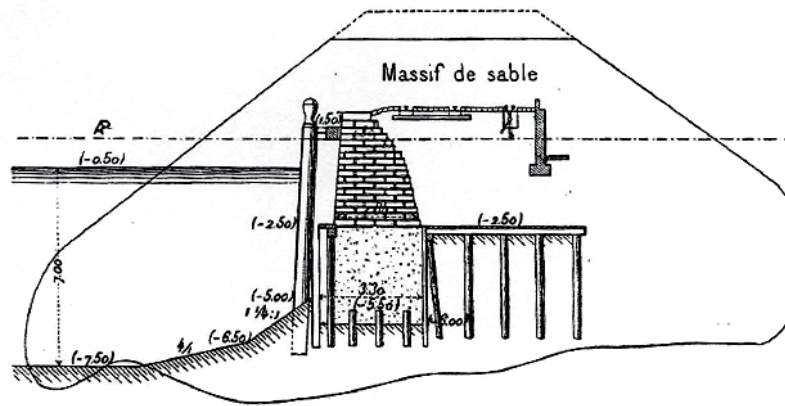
Quay wall construction in Amsterdam's Coenamerikahaven from 1954. Image credits: Stadsarchief, 2020
